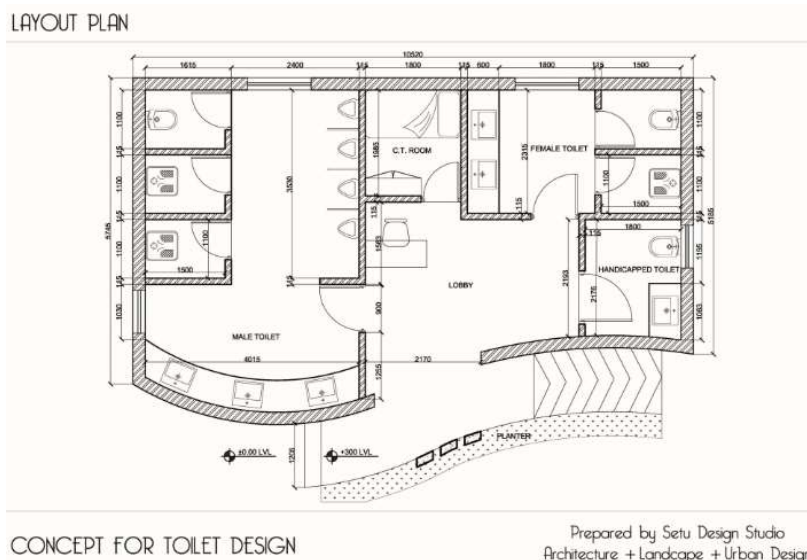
Layout Plan for the standardized Sulabh Toilet Design
